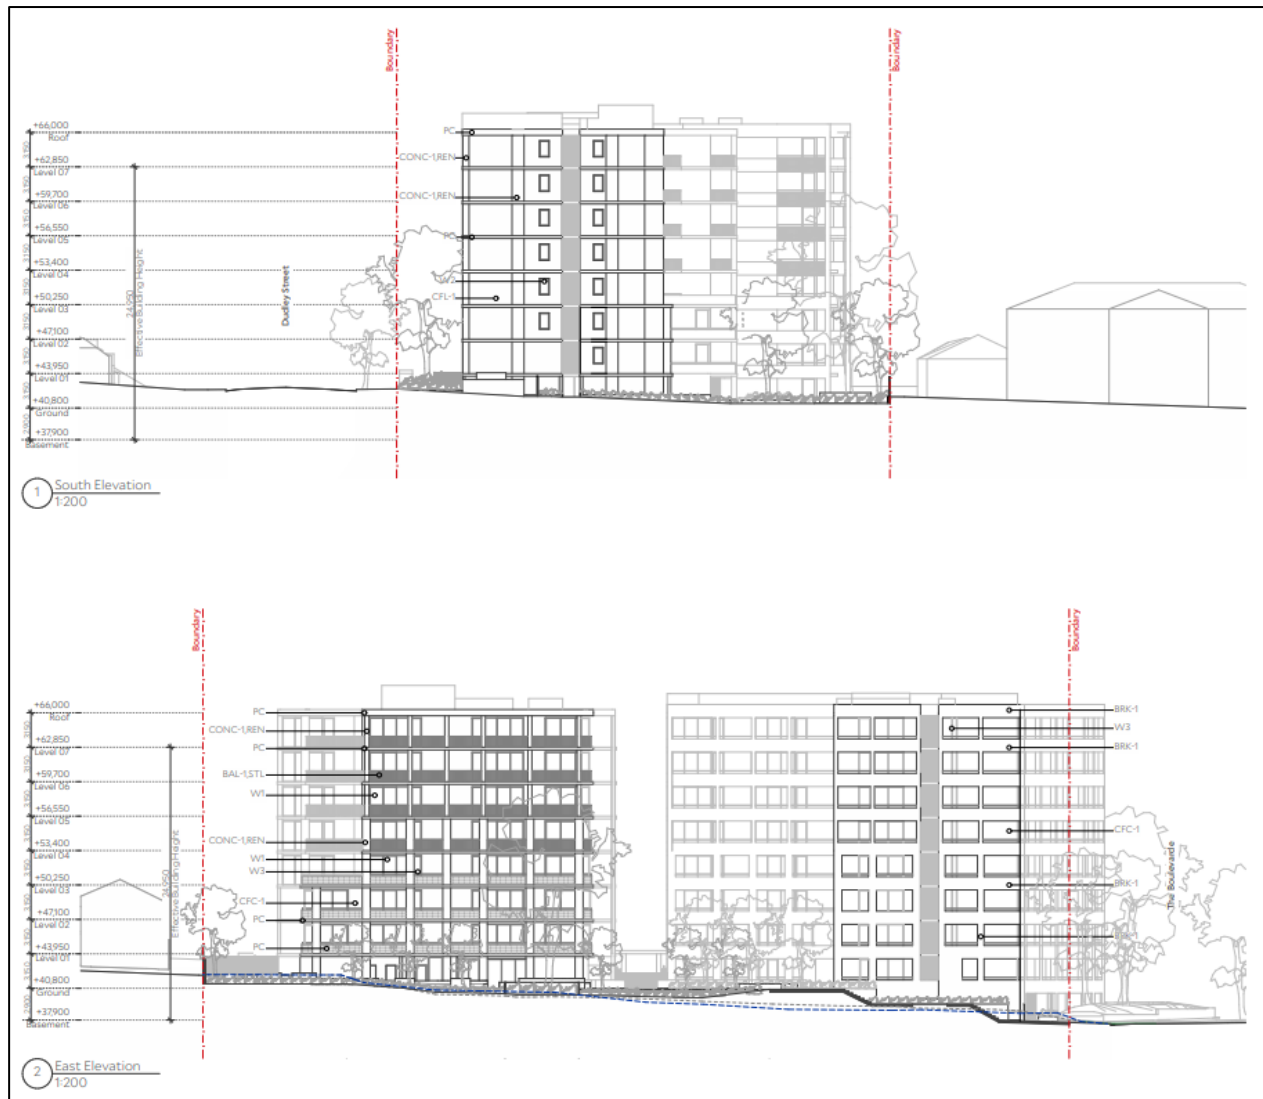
South and east elevations of the proposed development (Source: Collins and Turner, *Revision A 22/09/2025*)
